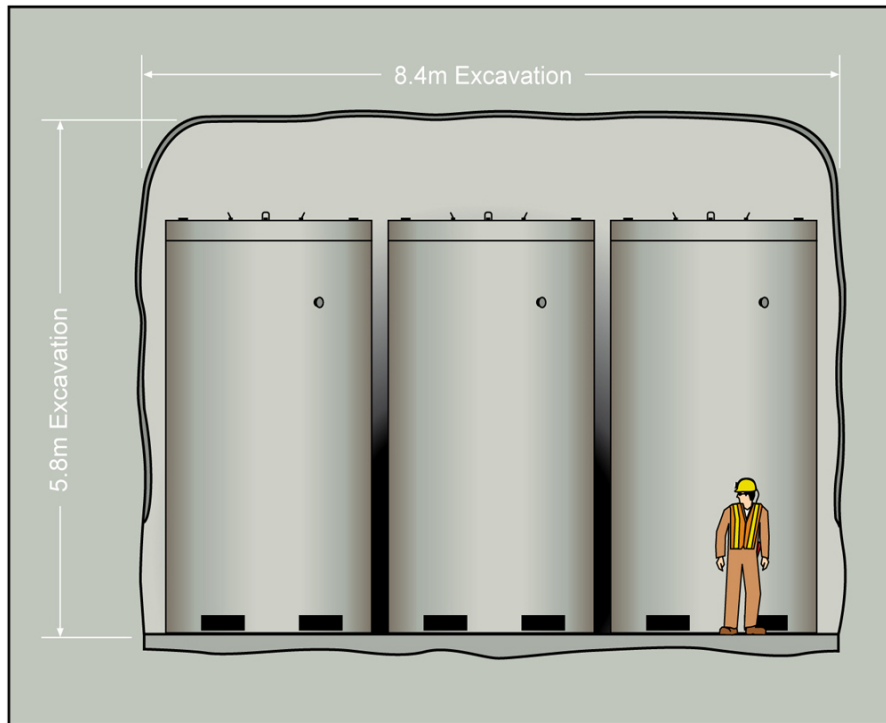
Typical Emplacement Room Configuration for ILW
